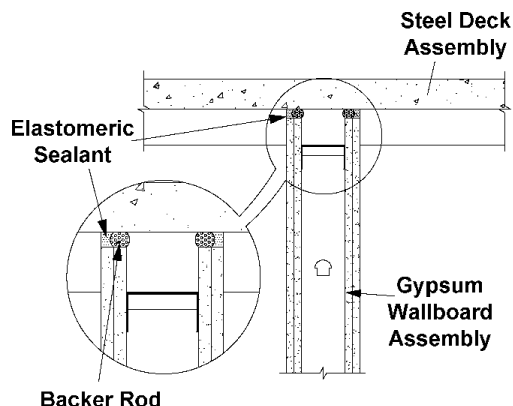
HEAD-OF-WALL JOINT - GYPSUM WALLBOARD WALL TO CONCRETE FLOOR
